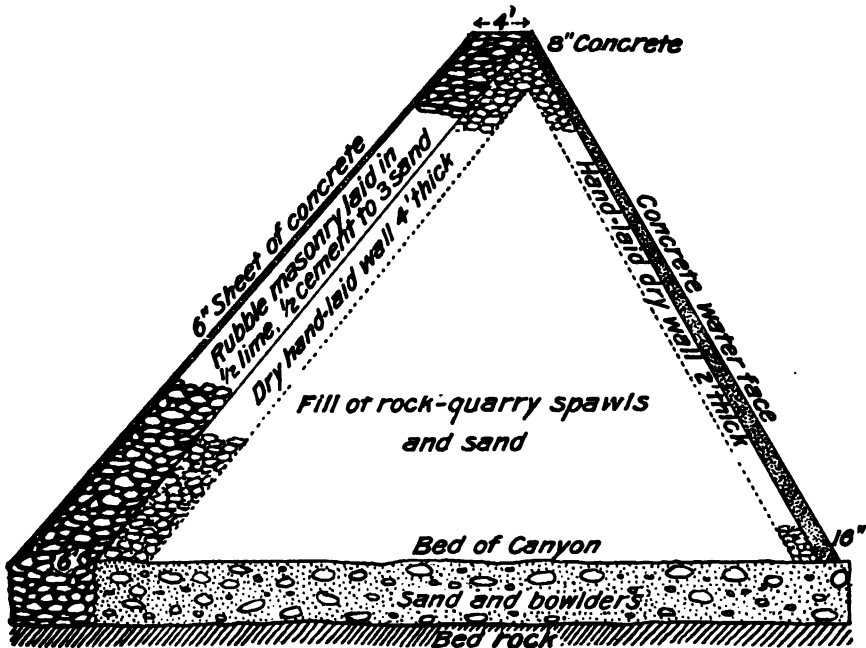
SKETCH OF RECONSTRUCTION OF CHATSWORTH PARK ROCK-FILL DAM.
